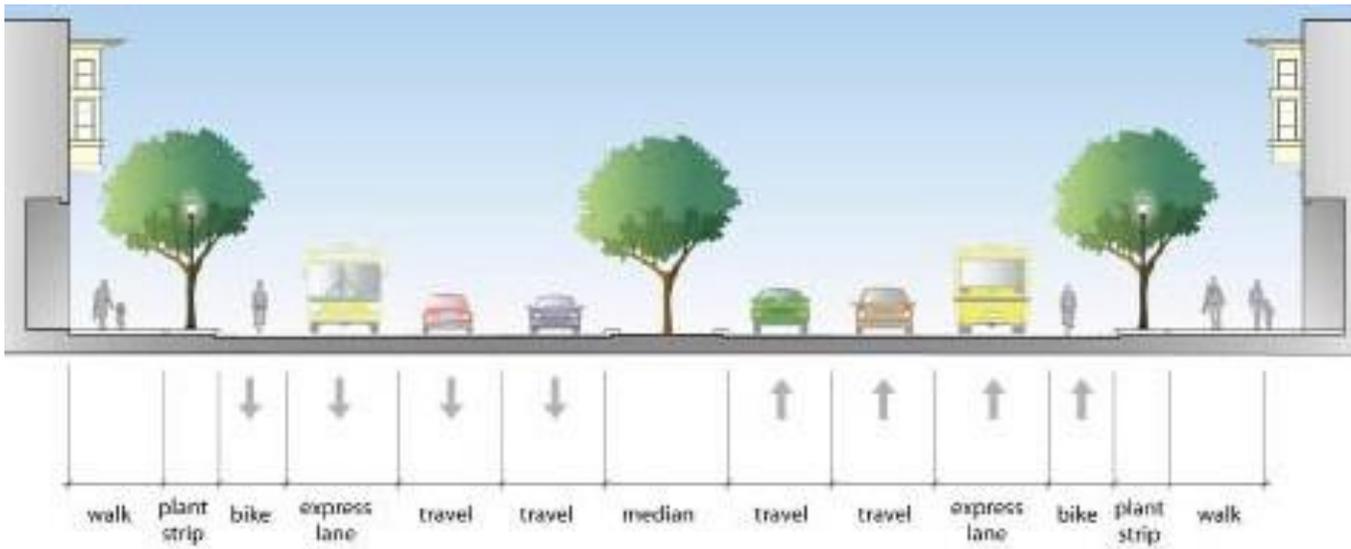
Watt Avenue Section, I-80 to Peacekeeper Way
